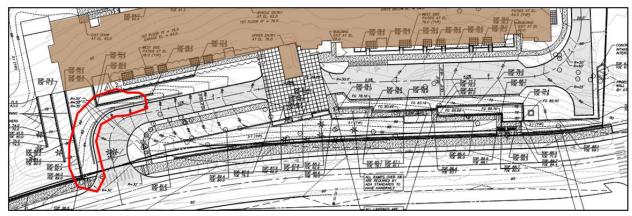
Missing Sidewalk of Proposed Neighborhood Street
